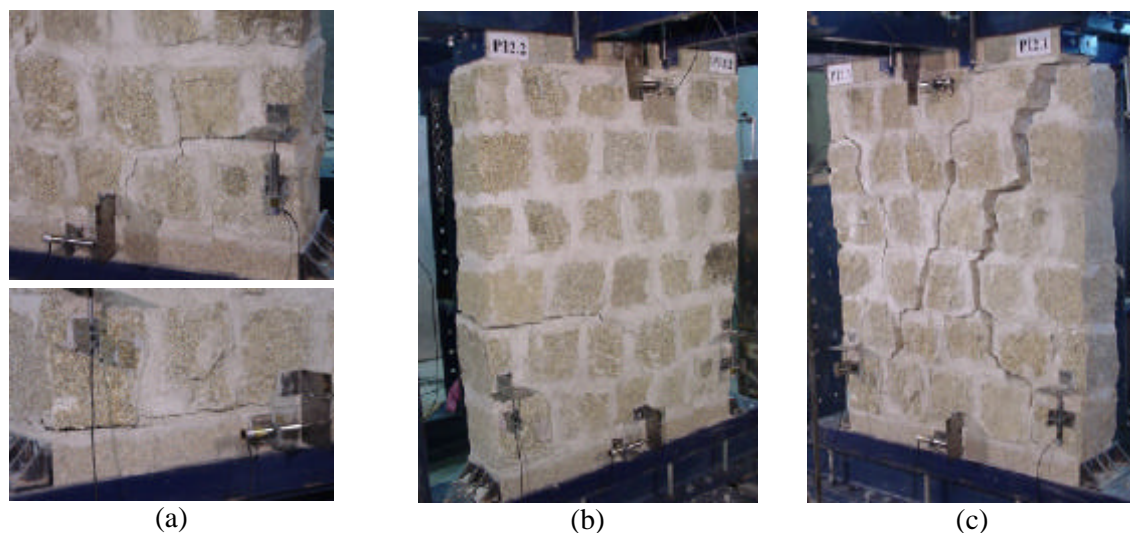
Failure mode and collapse of the walls WI.100; (a) bed joint cracks at the base of the wall WI2.100; (b) long bed joint crack of the wall WI2.100; (c) final failure pattern of the wall WI1.100
